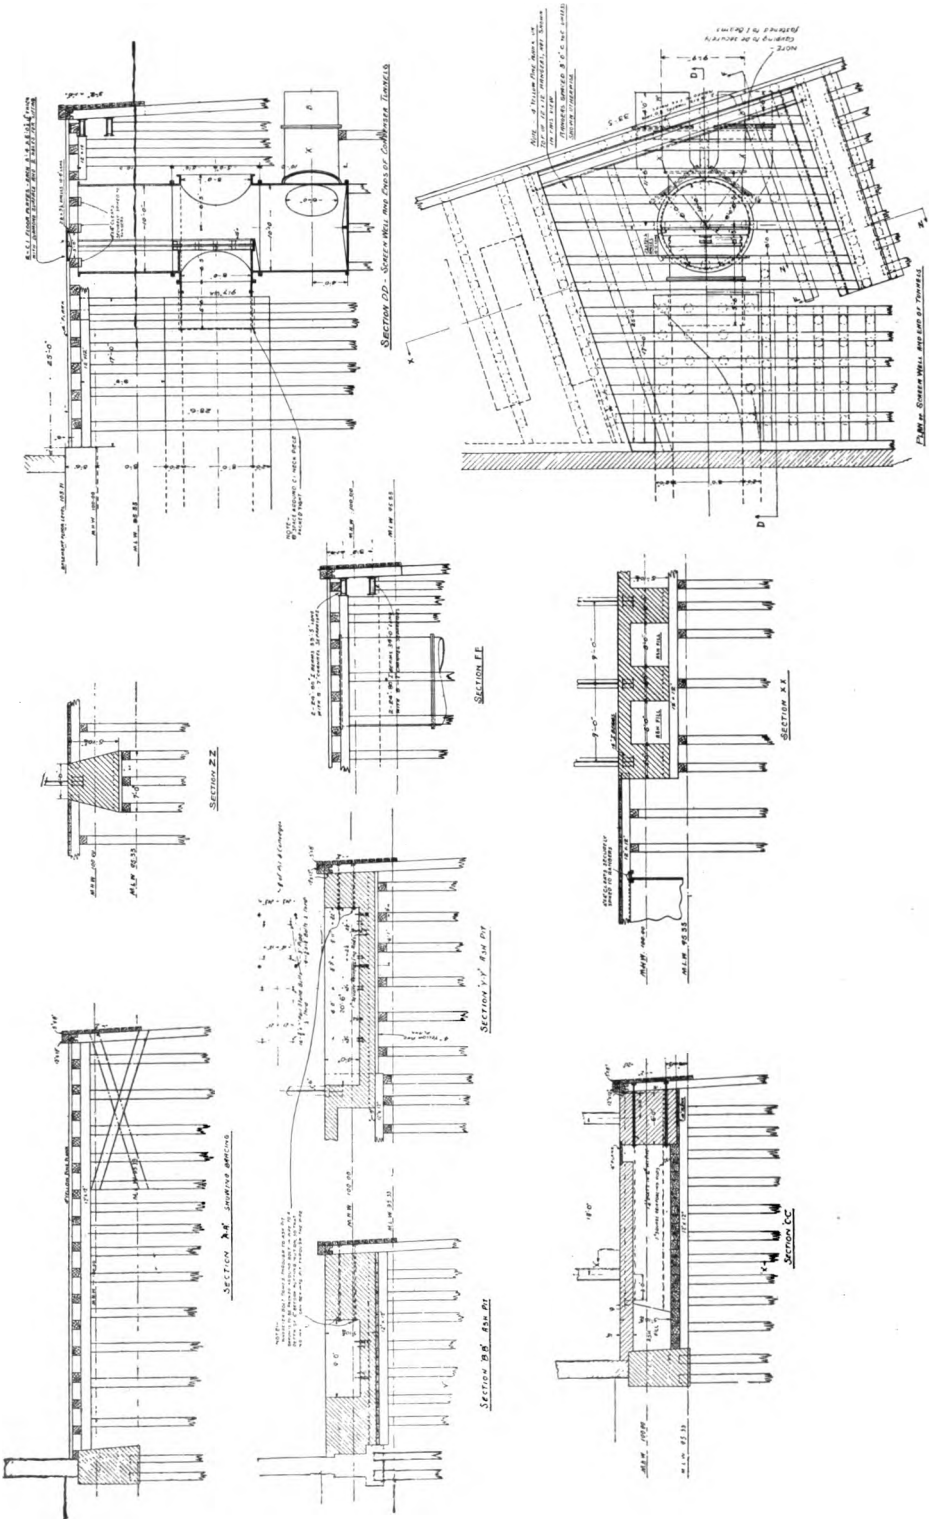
Details of Bulkhead Wall, Gold Street Station.
